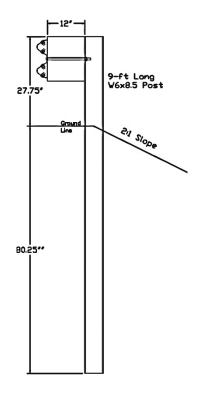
Barrier Installation, Test No. MGS221-1 [15]
